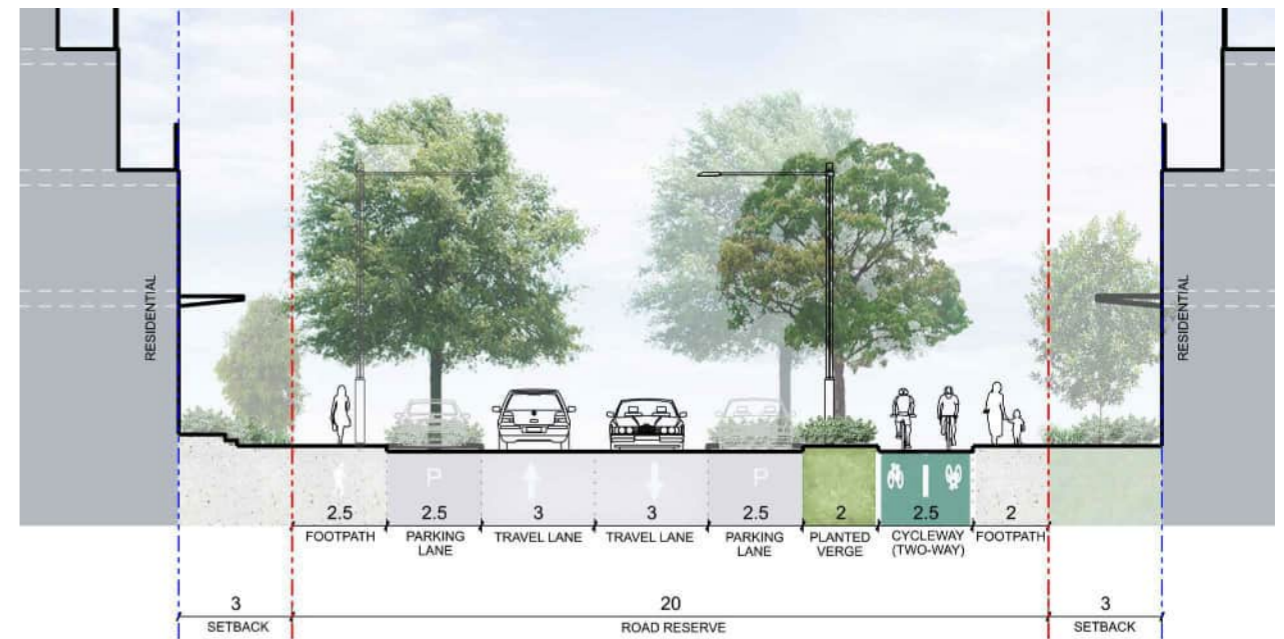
Denham Street, Denham Street Extension (New Street) and Llewellyn Street - Typical Section
